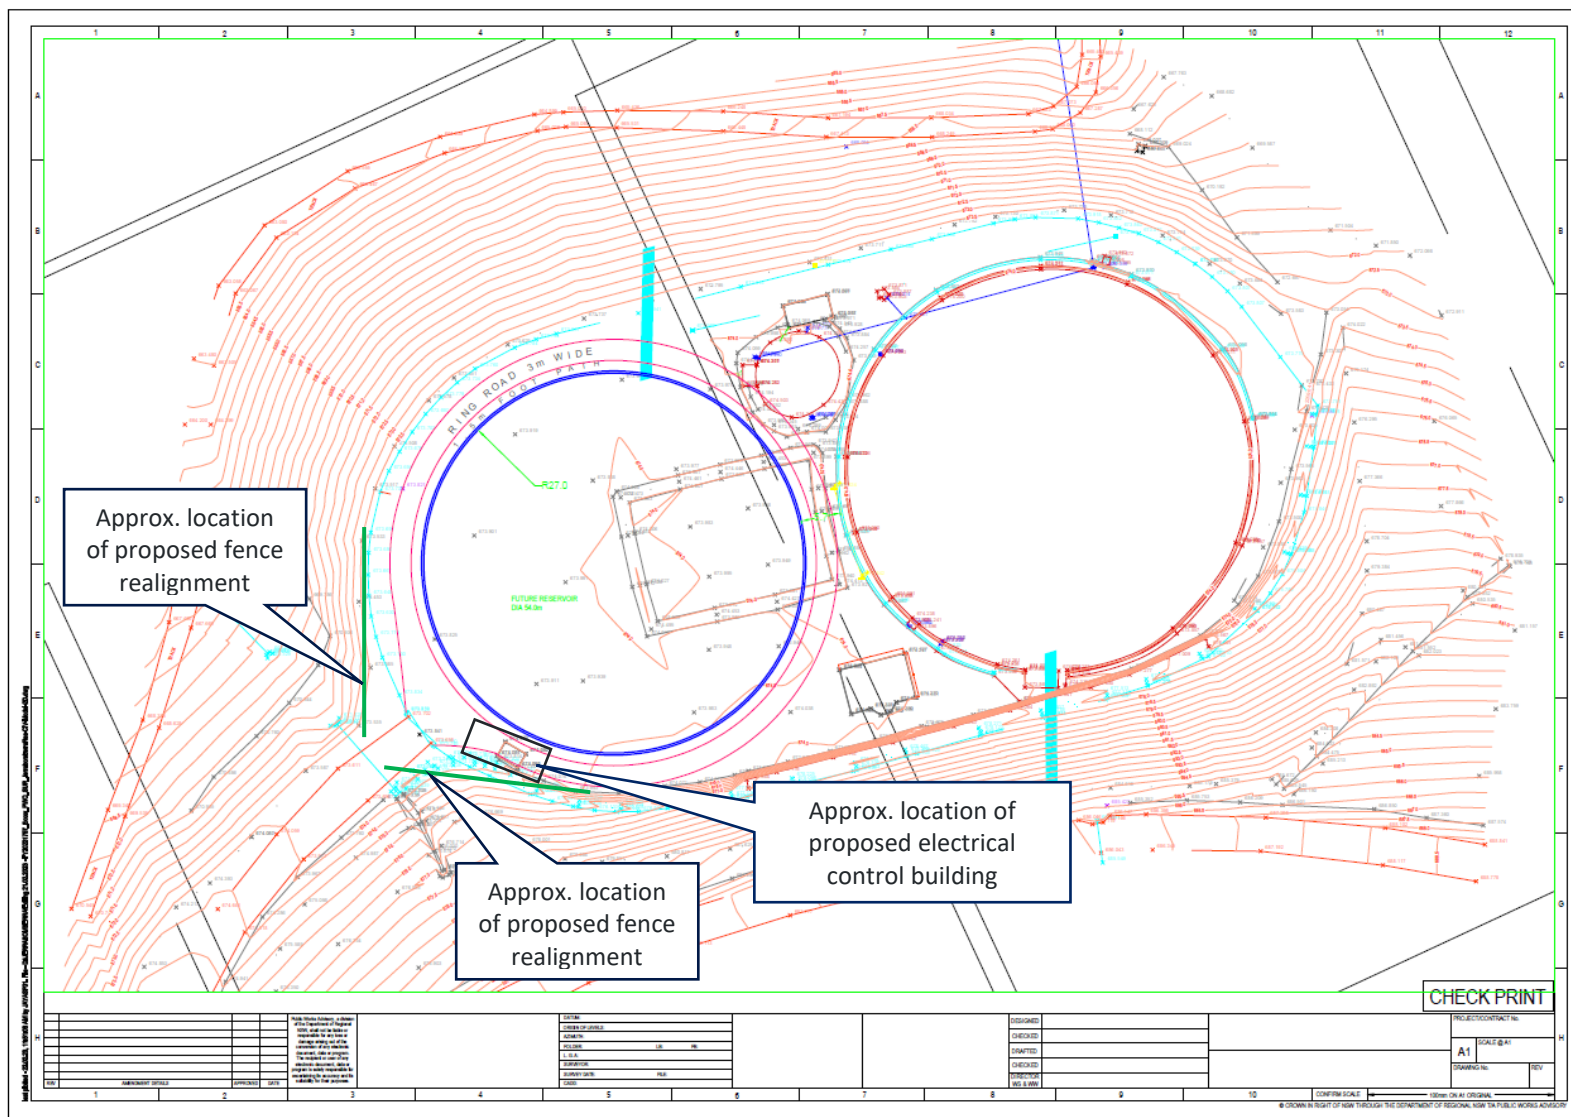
Site Plan for proposed new water reservoir and electrical building
